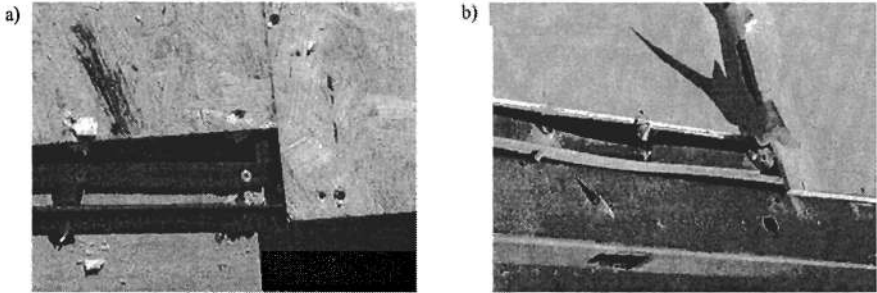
Typical failure modes of sheathing connections: a) OSB, b) gypsum wallboard.
